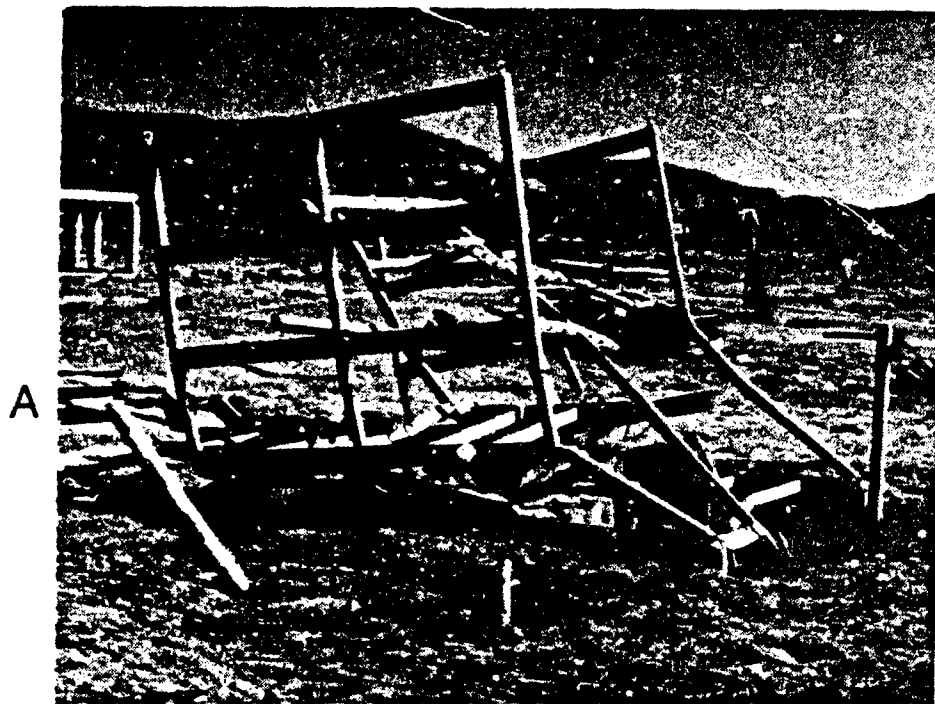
Posttest Photographs of Steel Frame Building, Experiment 4140.
